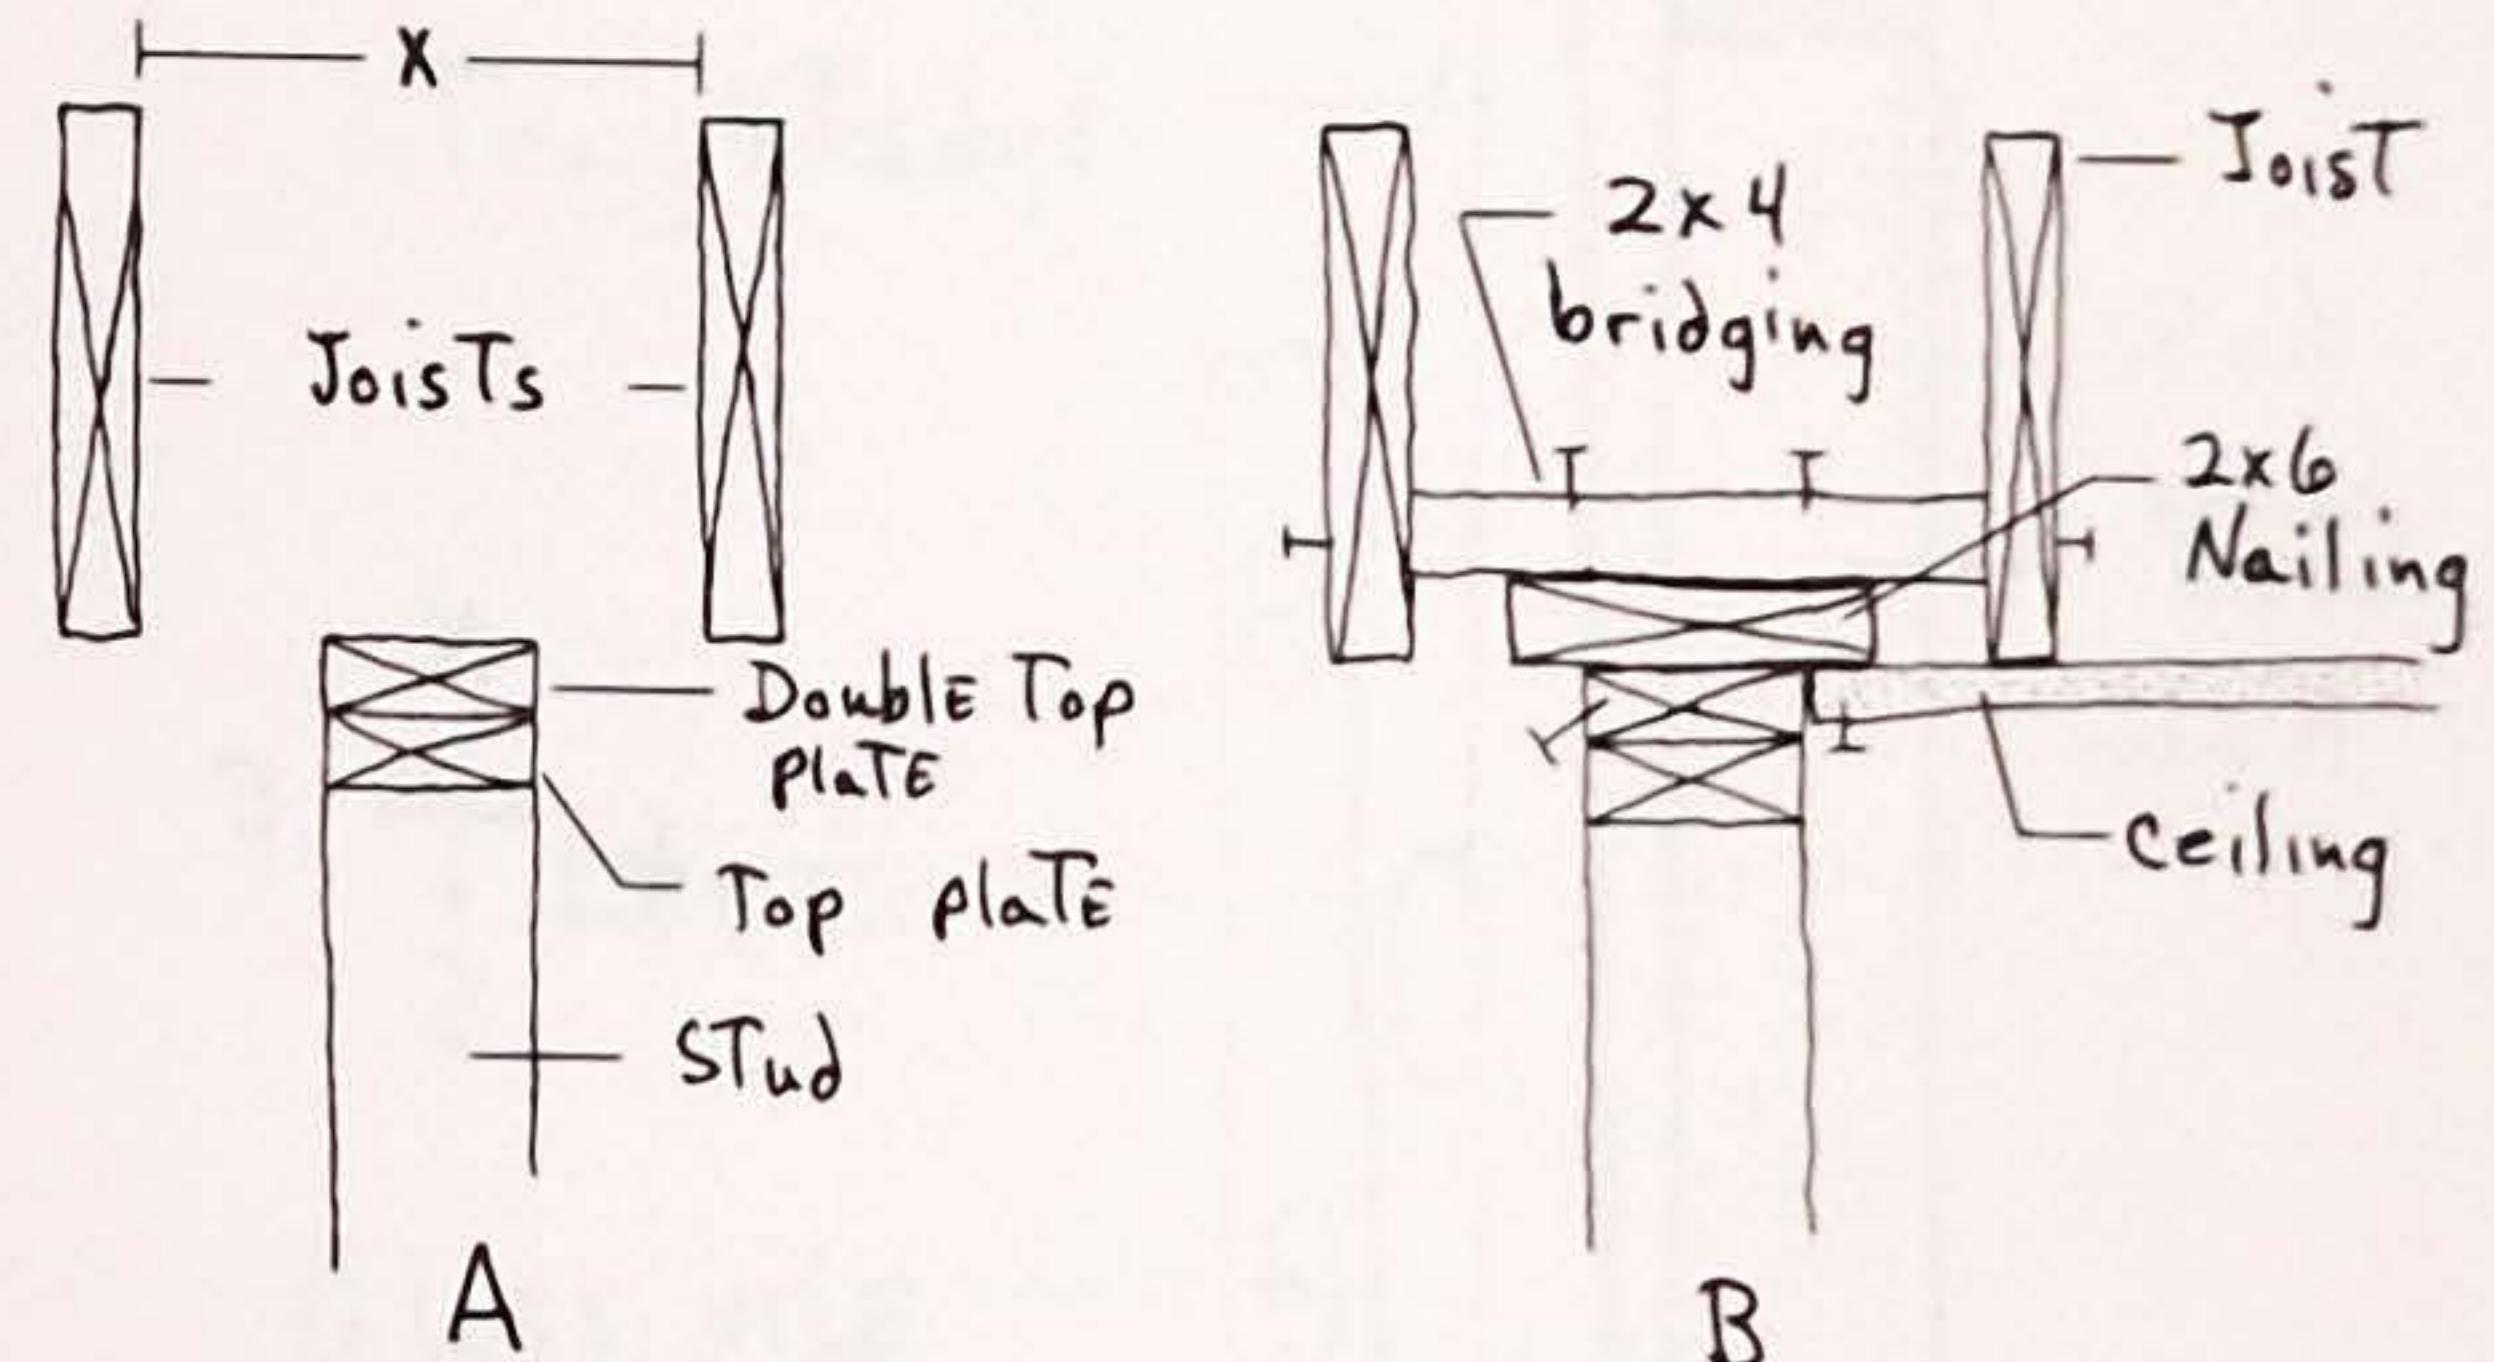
A WALL PARALLEL TO THE JOISTS
